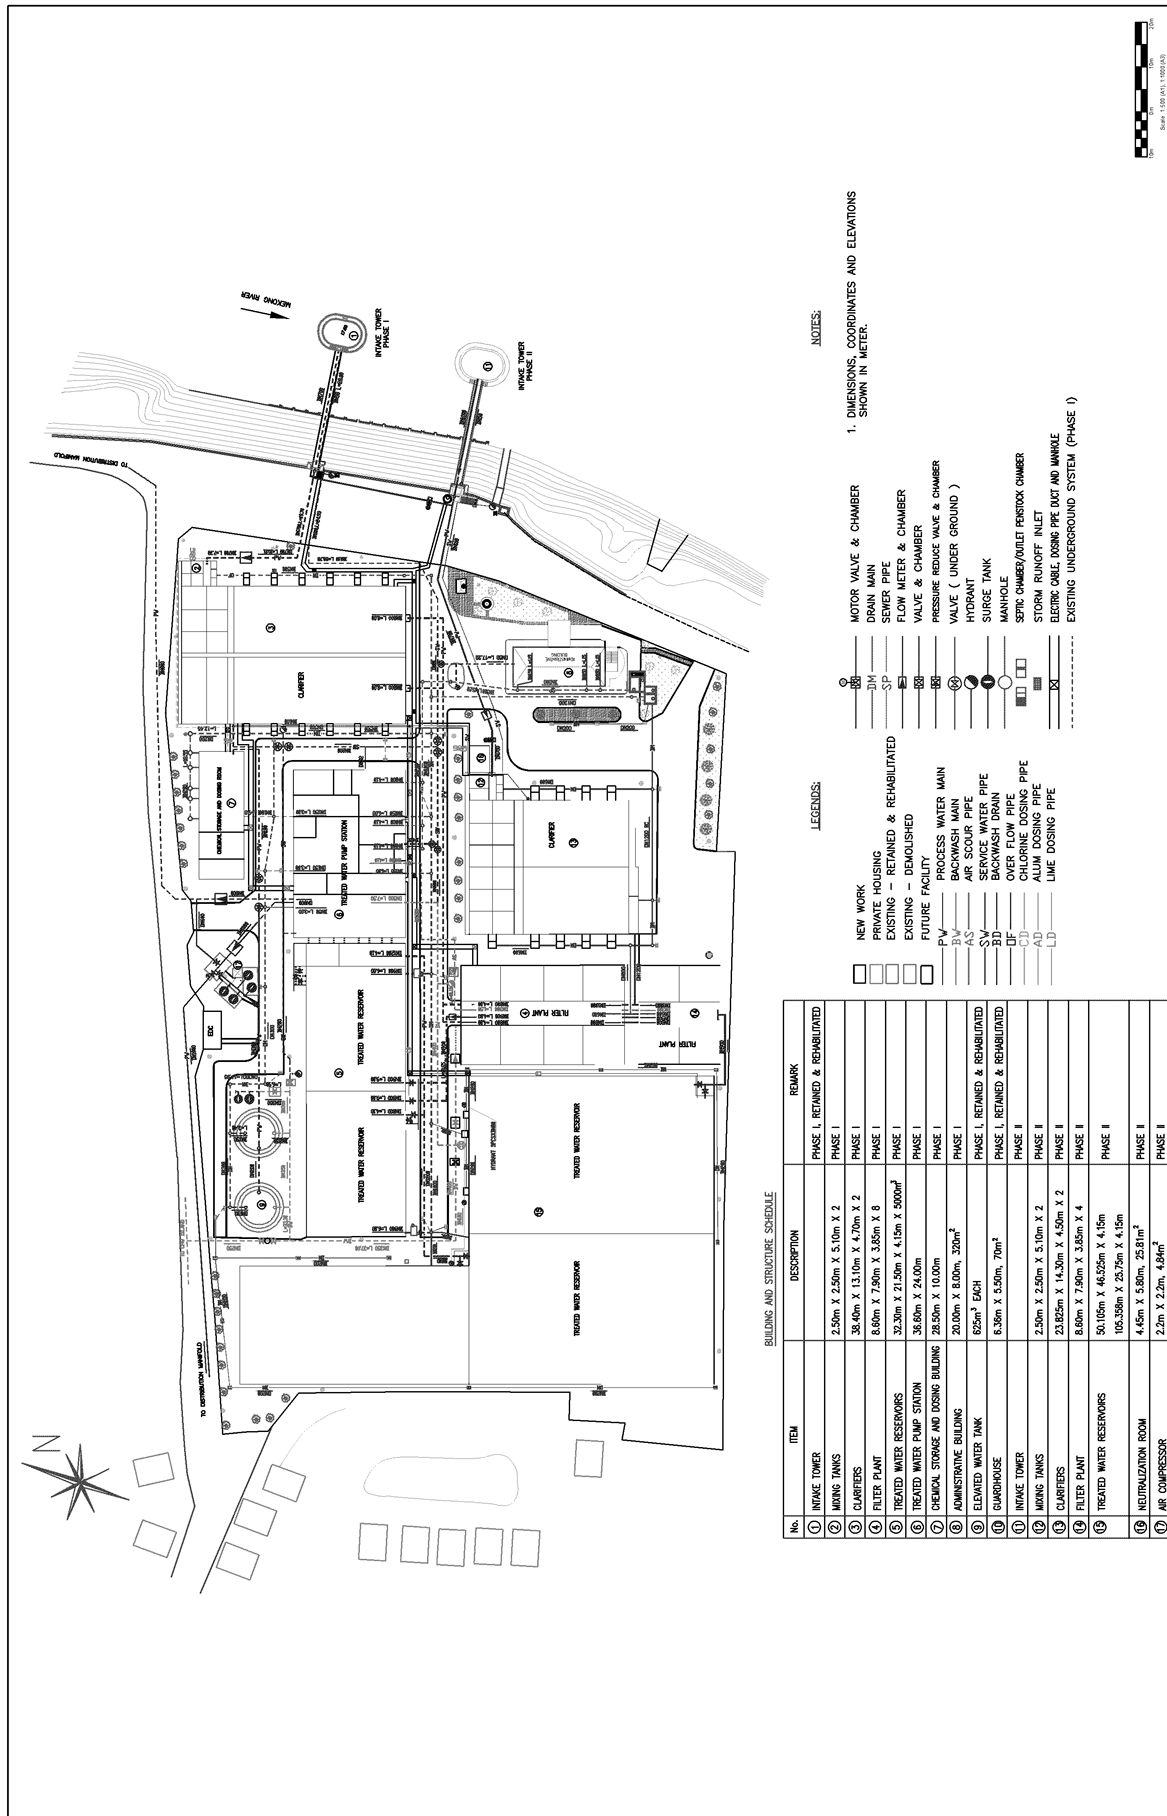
Chroy Changvar - General Plan of the Water Treatment Site and Layout of The Facilities
